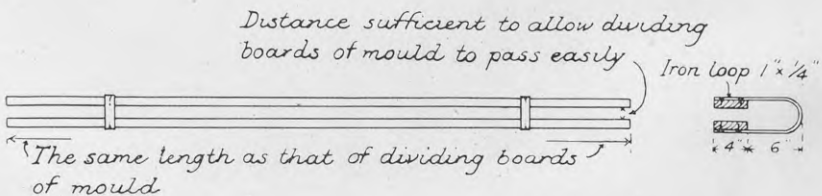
PARALLEL BOARDS USED IN REMOVAL OF MOULD.
